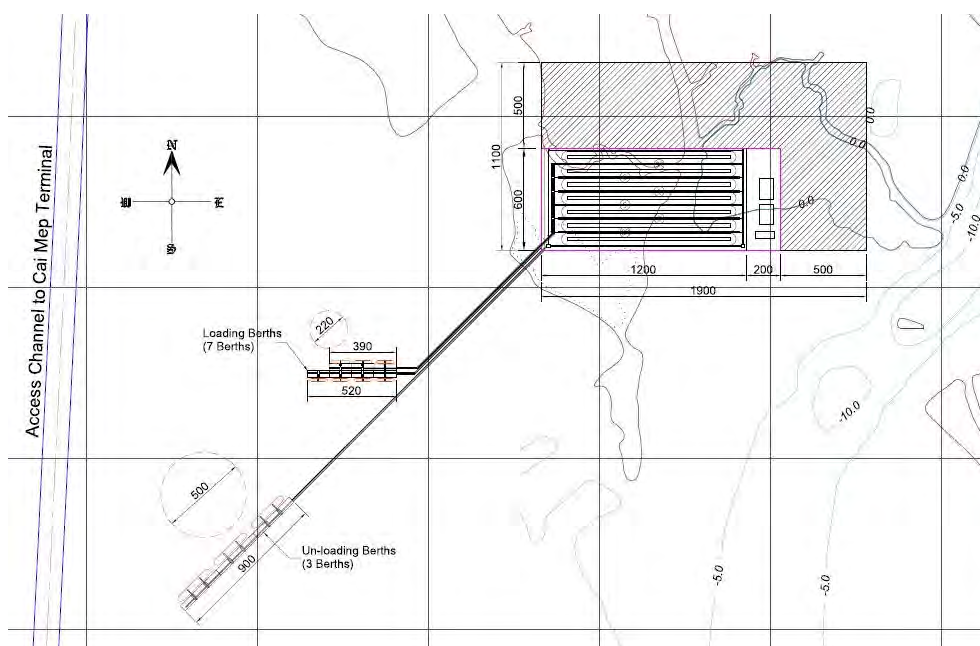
Layout of Fixed Type Imported Coal Transshipment Terminal in Cai Mep
